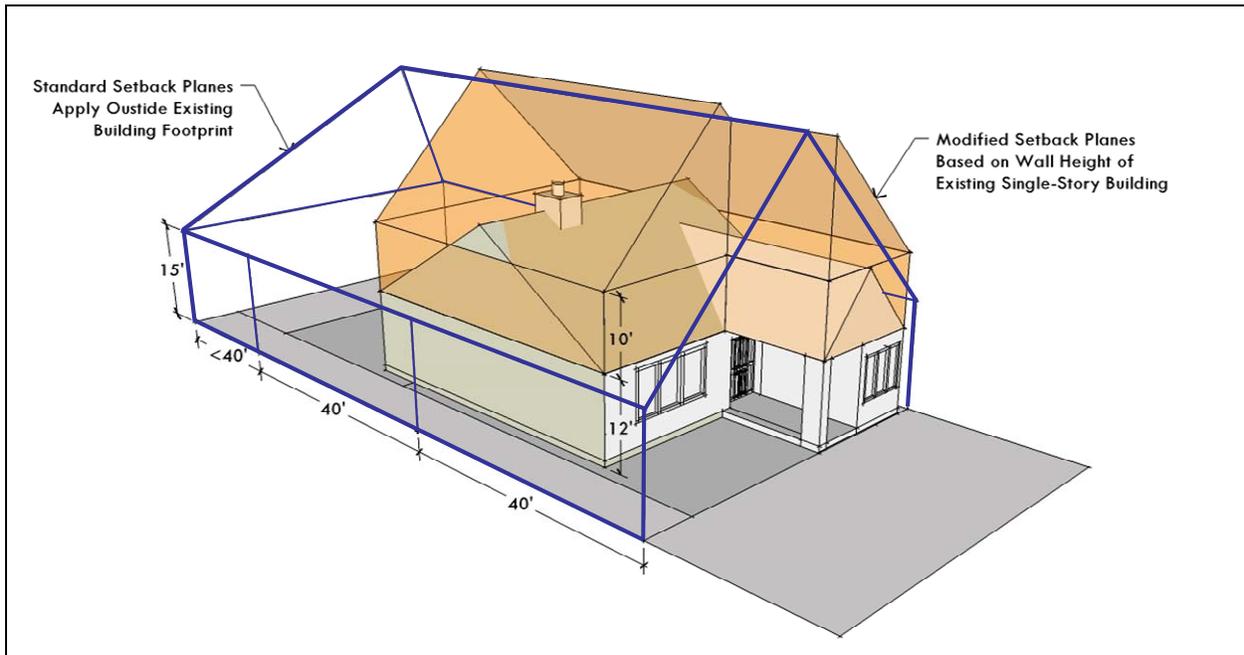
Side Setback Plane Exception for Existing Single-Story Buildings
